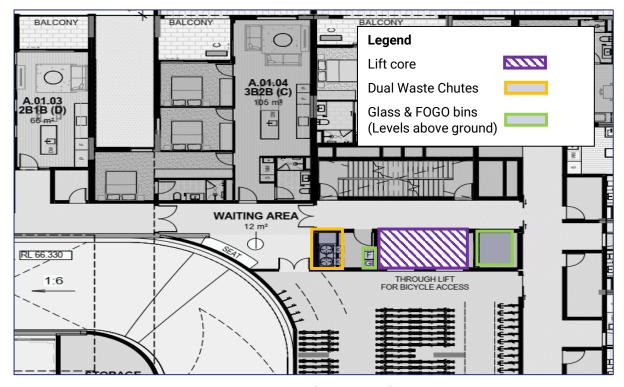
Bin Chute Location and Layout – Typical Layout (North Building)
